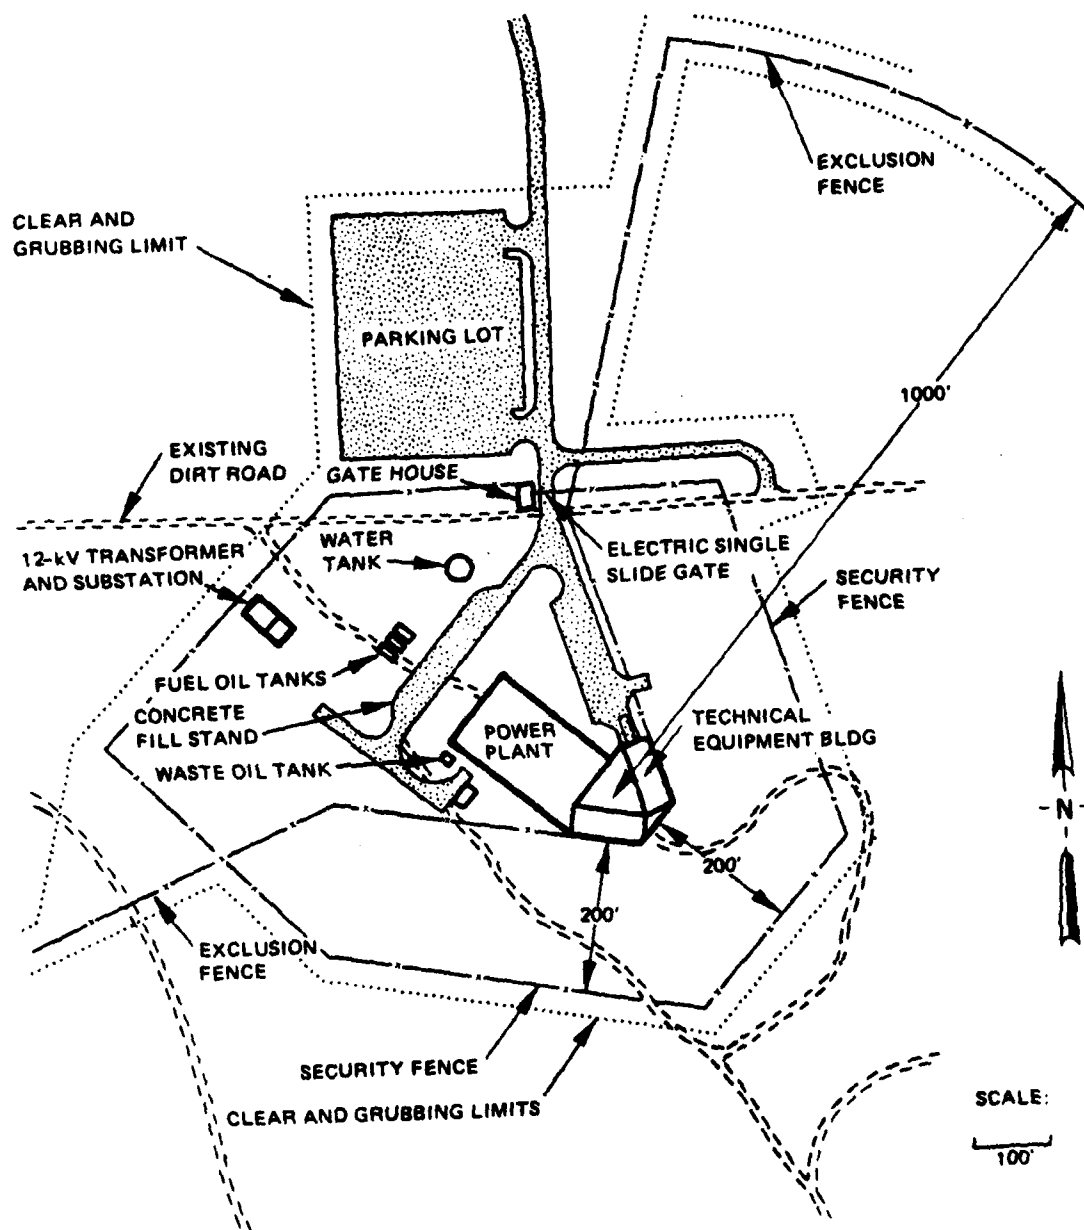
PROPOSED SITE PLAN FOR PAVE PAWS
